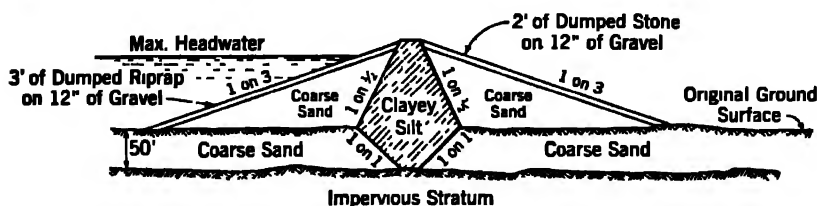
Suitable design for a site where both clayey silt and coarse sand are available and where foundation is pervious for depth of 50 ft. (Note: Steel sheet piling might be substituted for foundation cutoff.)
